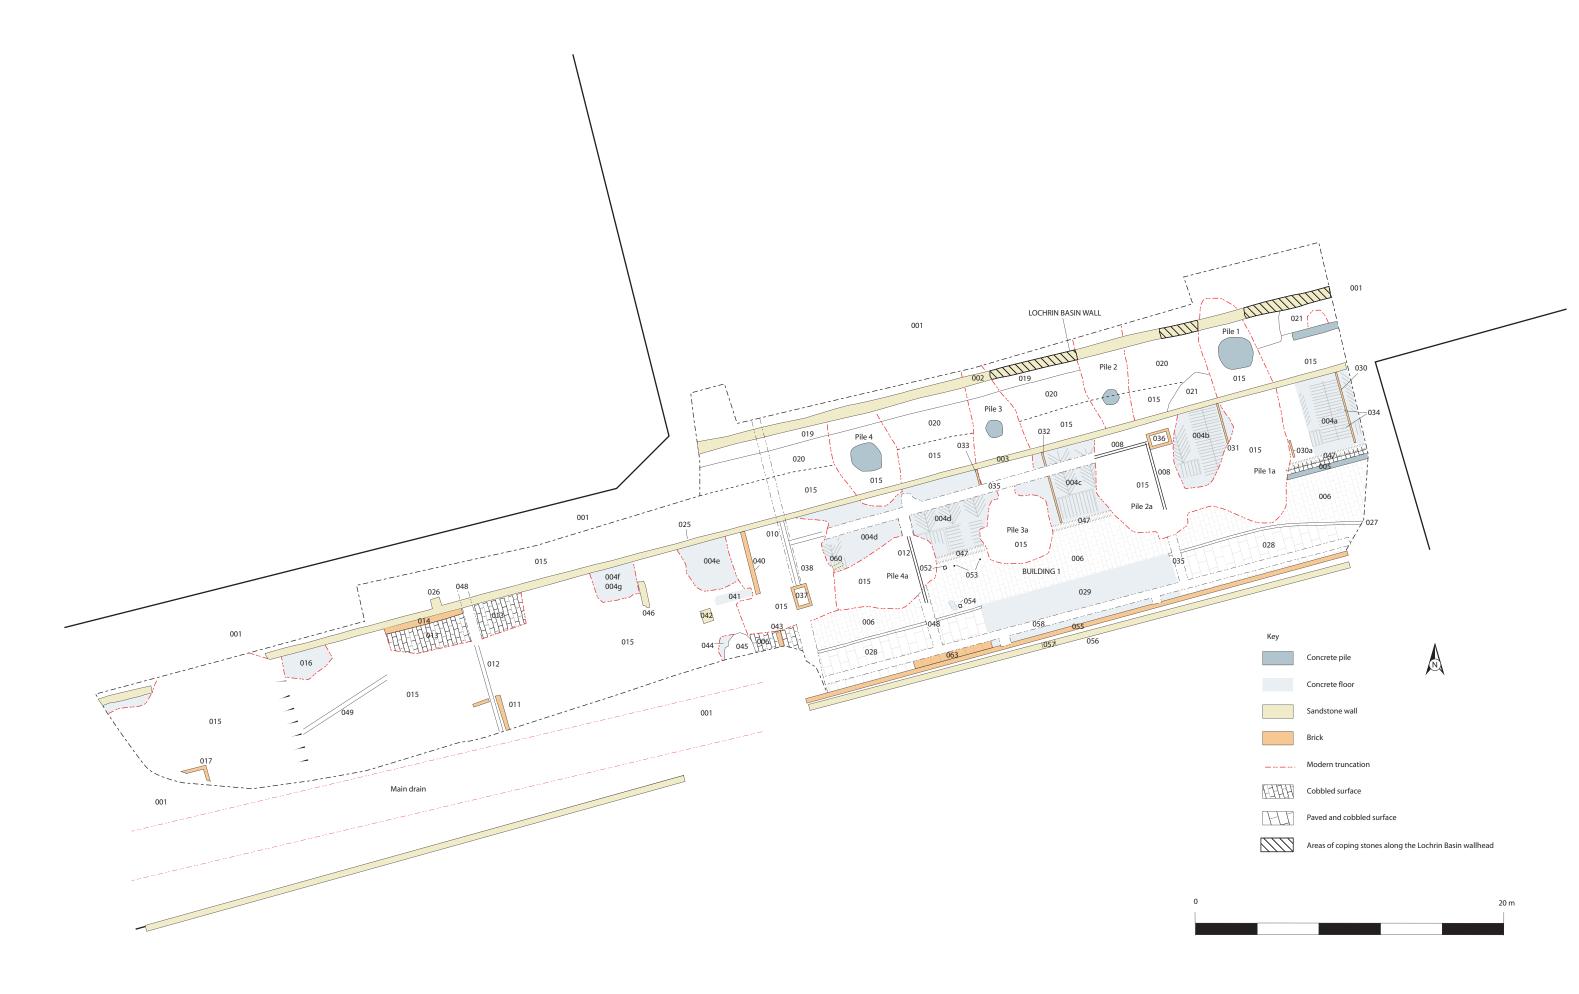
Plan showing location of Lochrin Basin wall and excavated features within Building 1
